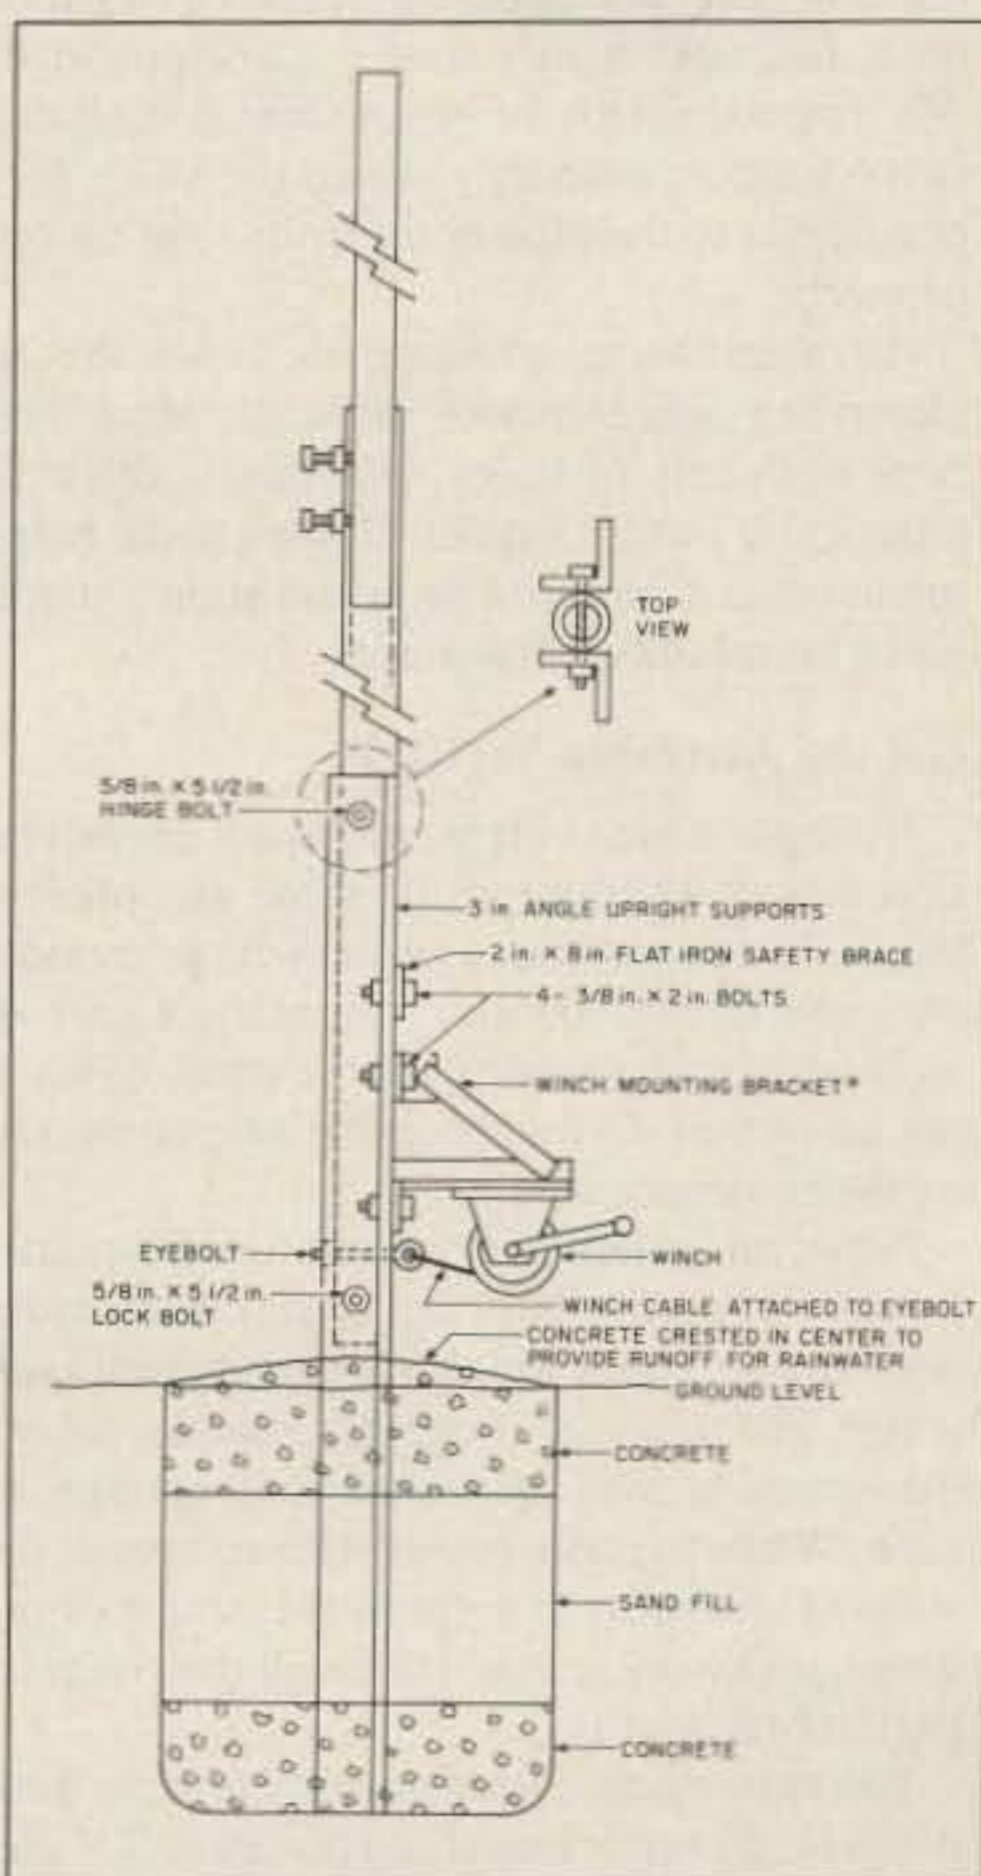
B. Side view of mast-supporting angle brackets and winch installation.
